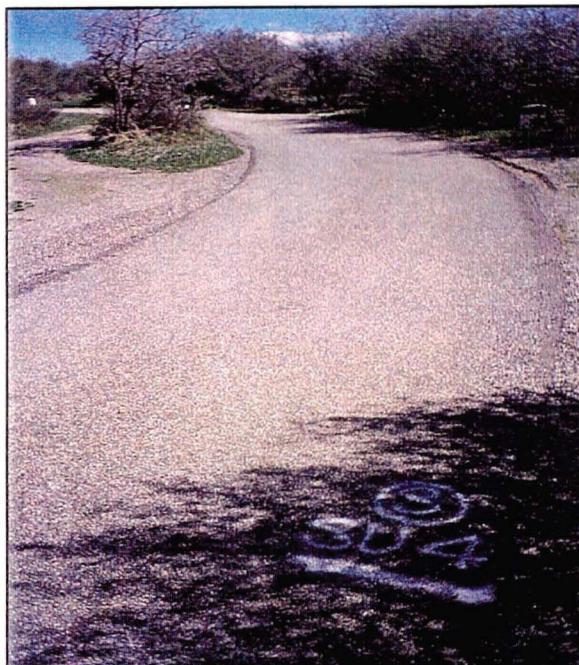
Section 3, Sample Unit 4 (MP 0.68)
